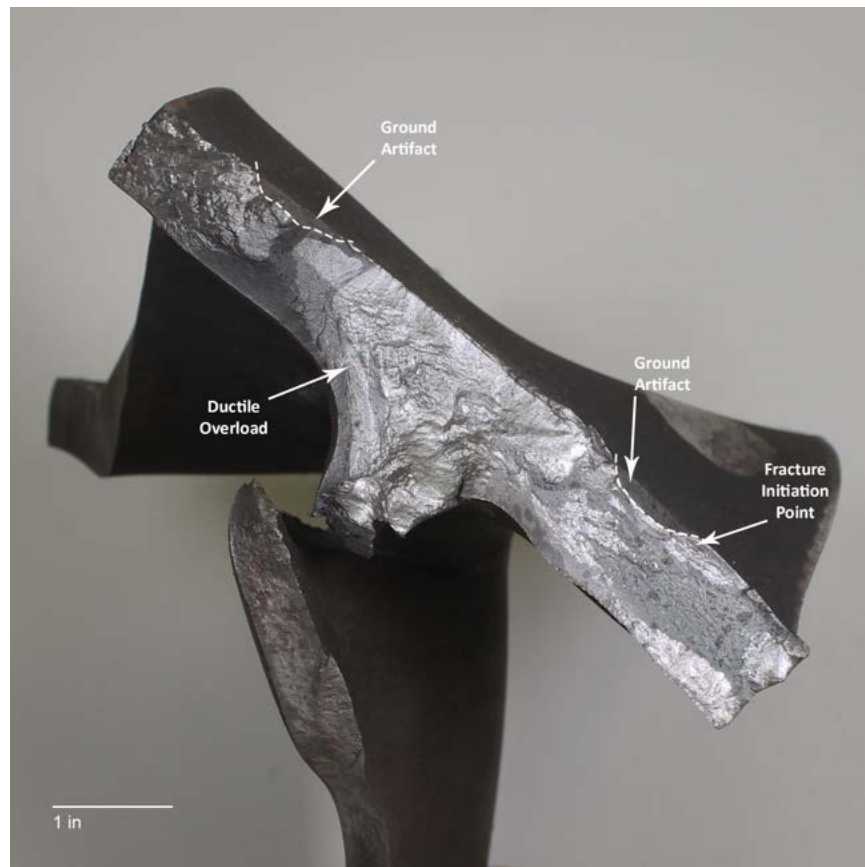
W36RBS-0.125NGT-T94 top flange fracture looking towards the end-plate.
